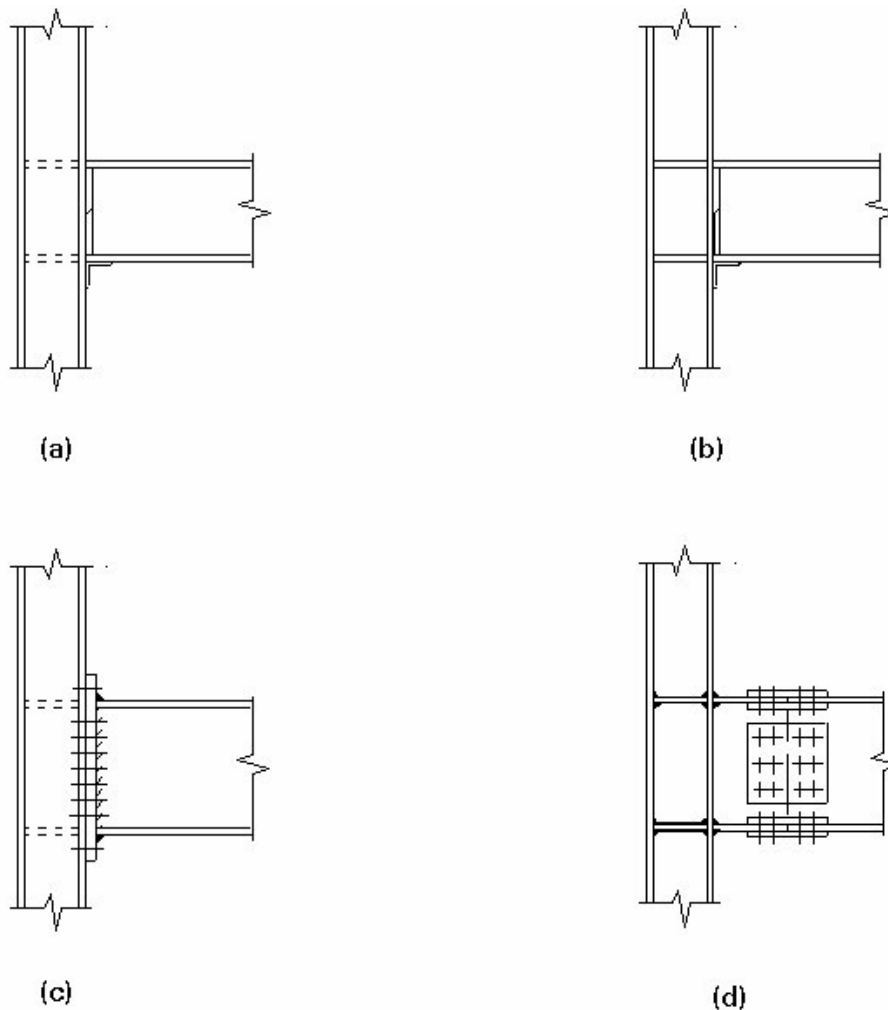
Steel beam-to-column connections in a moment resisting steel frame. [29]
